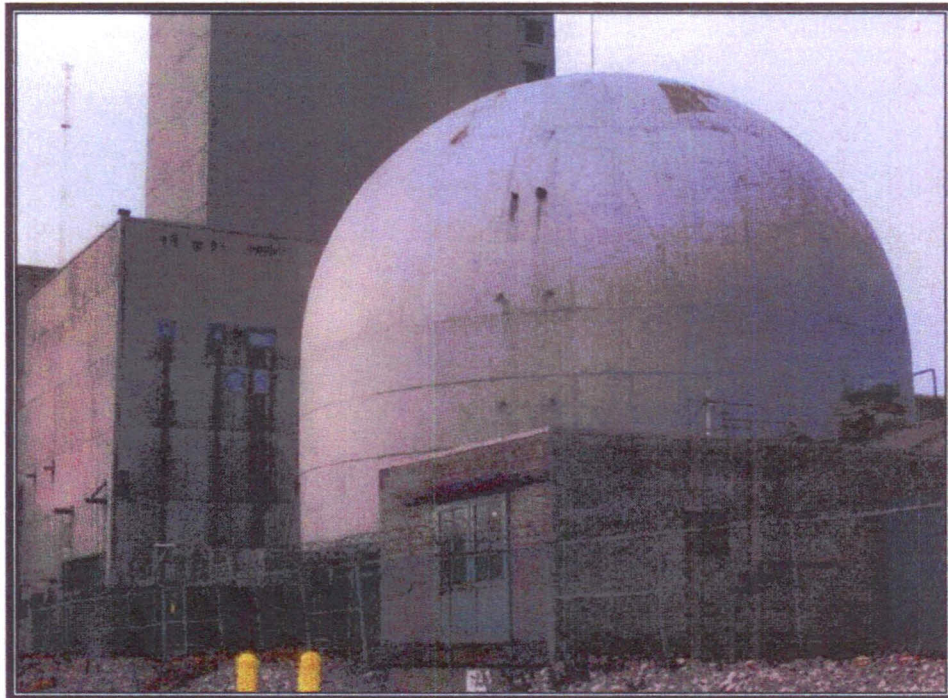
View of reactor containment building looking southwest (Photograph by RCG&A, 2008)
